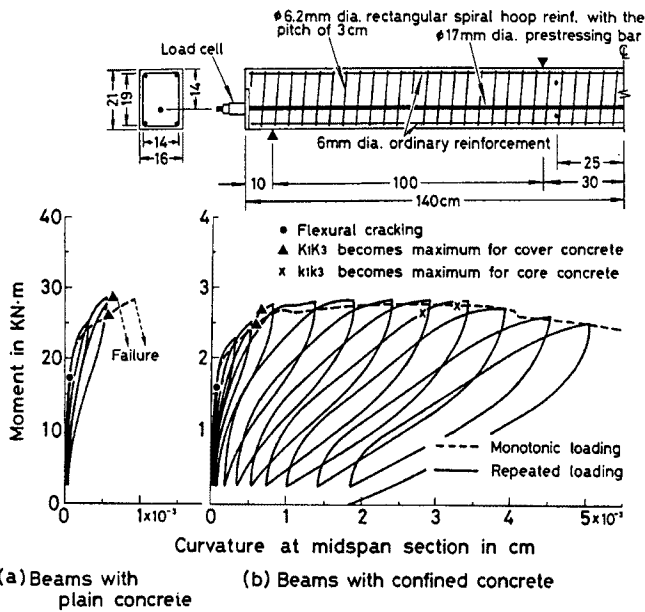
Enhancement of curvature ductility of prestressed concrete beam by lateral confinement of concrete
